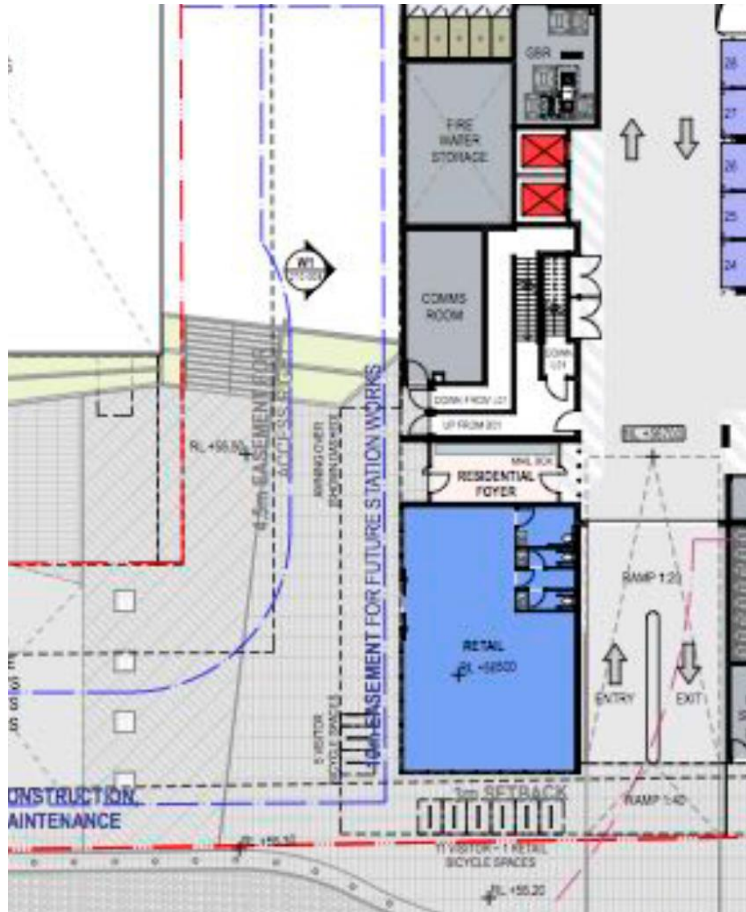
Secondary access to the development has been provided via a new residential foyer that can be accessed from the Plaza.
